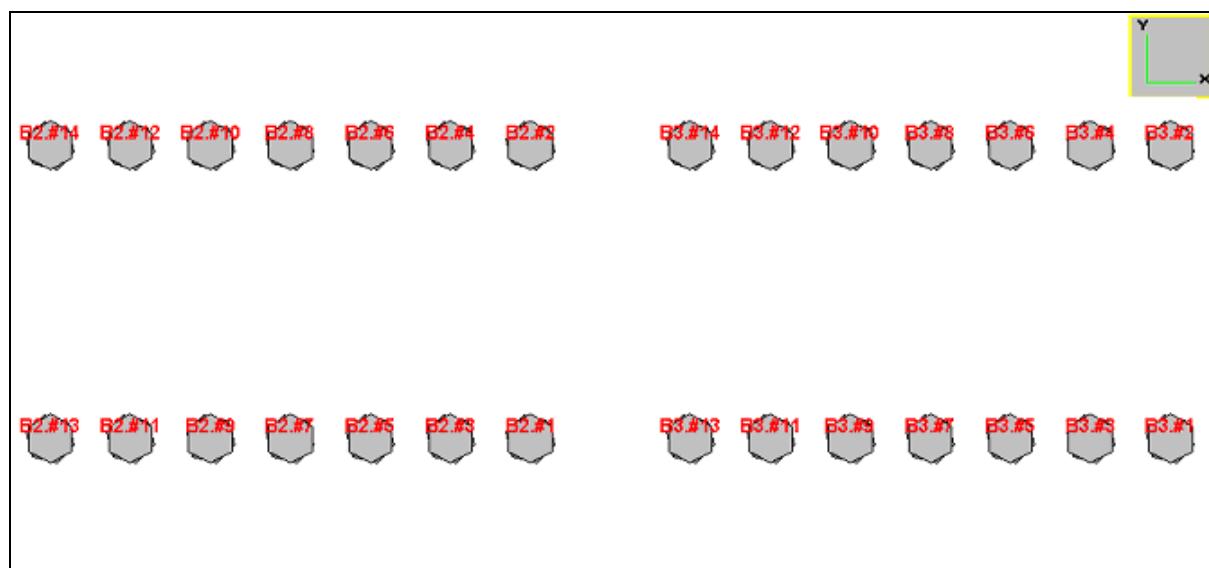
Upper flange bolts numbering (distances: 183mm, 50mm)
